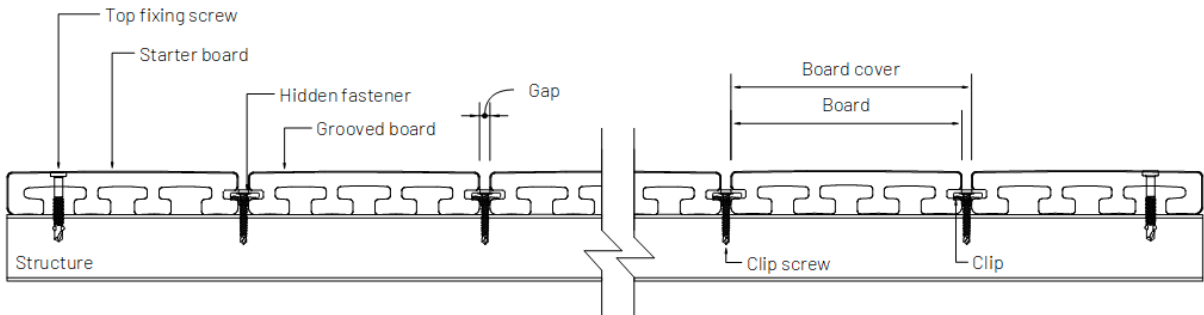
TYPICAL HIDDEN DECK FASTENER ASSEMBLY
